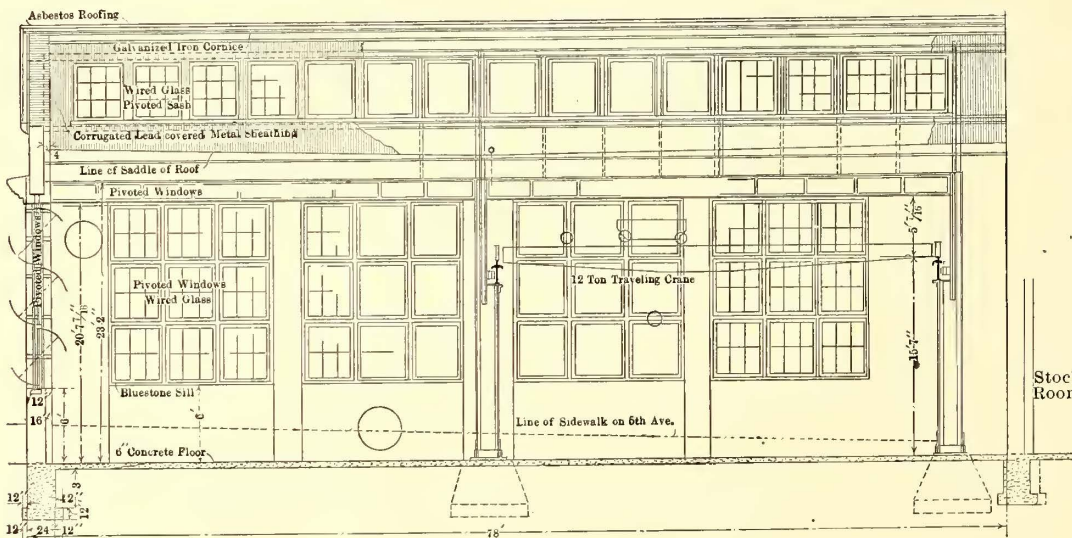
TRANSVERSE SECTION OF MACHINE SHOP, SHOWING THE LIGHTING ARRANGEMENTS
